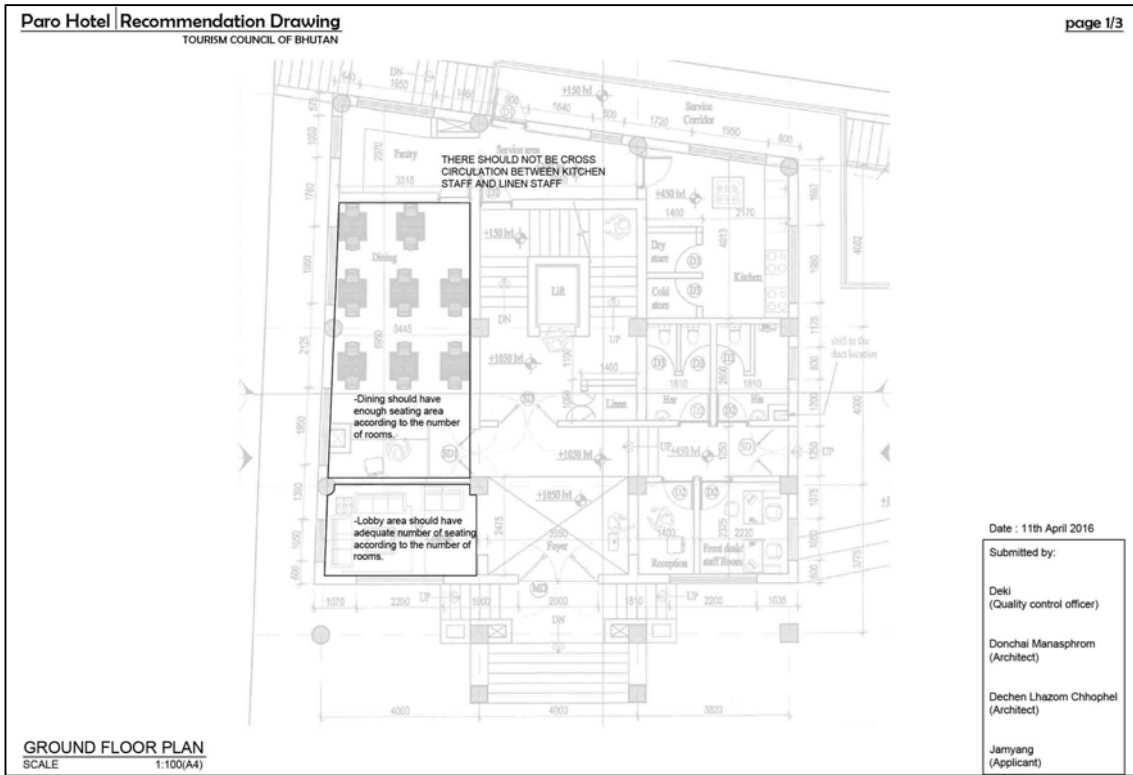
Recommendation drawings of Paro hotel.
